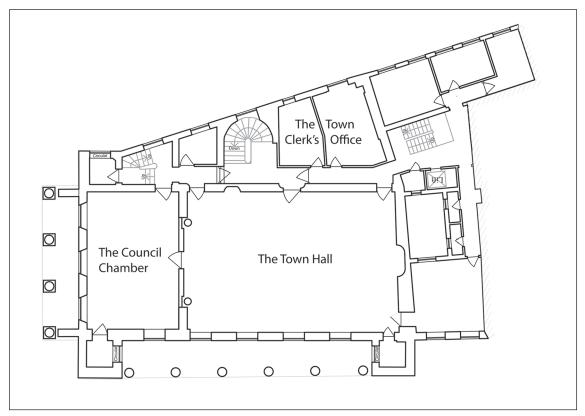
The first-floor plan, annotated with the original room names and uses. [Plan based on the asset management floor plan of the Isle of Wight Council's Corporate and Facilities Management team]
